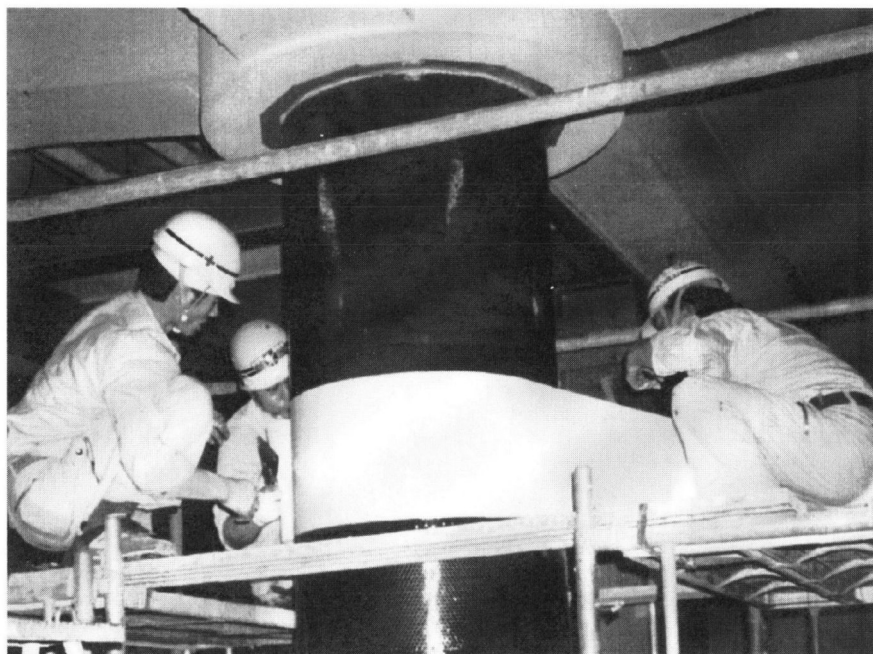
Retrofitting work for building column using carbon fiber sheet.
